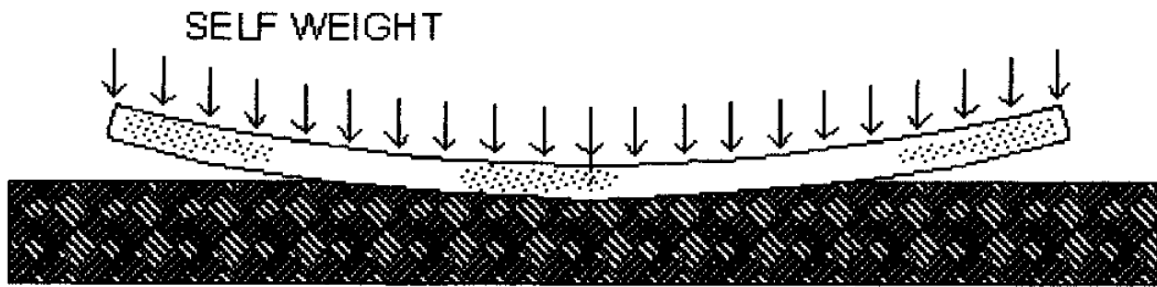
Upward concave curling of a concrete slab (Mailvaganam et al., 2000)
